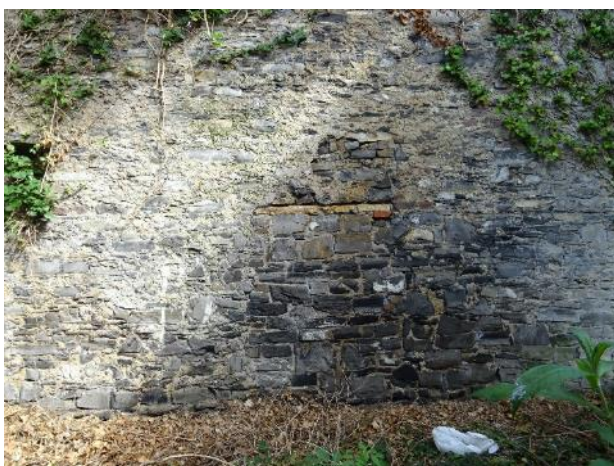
Coach House, west section, north internal elevation, lintel at section close to the central opening.
